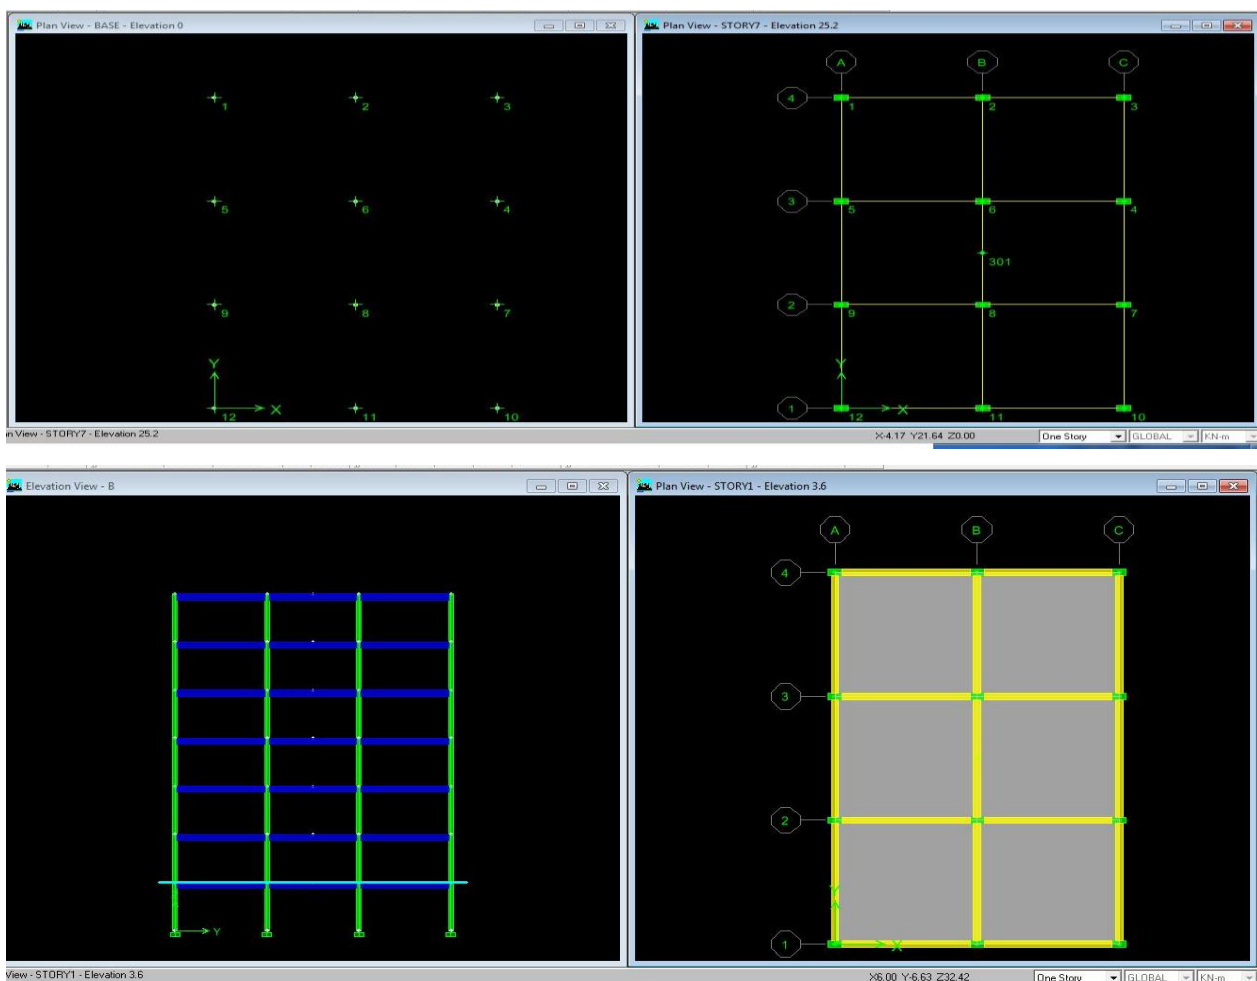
Plane & Elevation of Existing Building To Be Retrofitted
